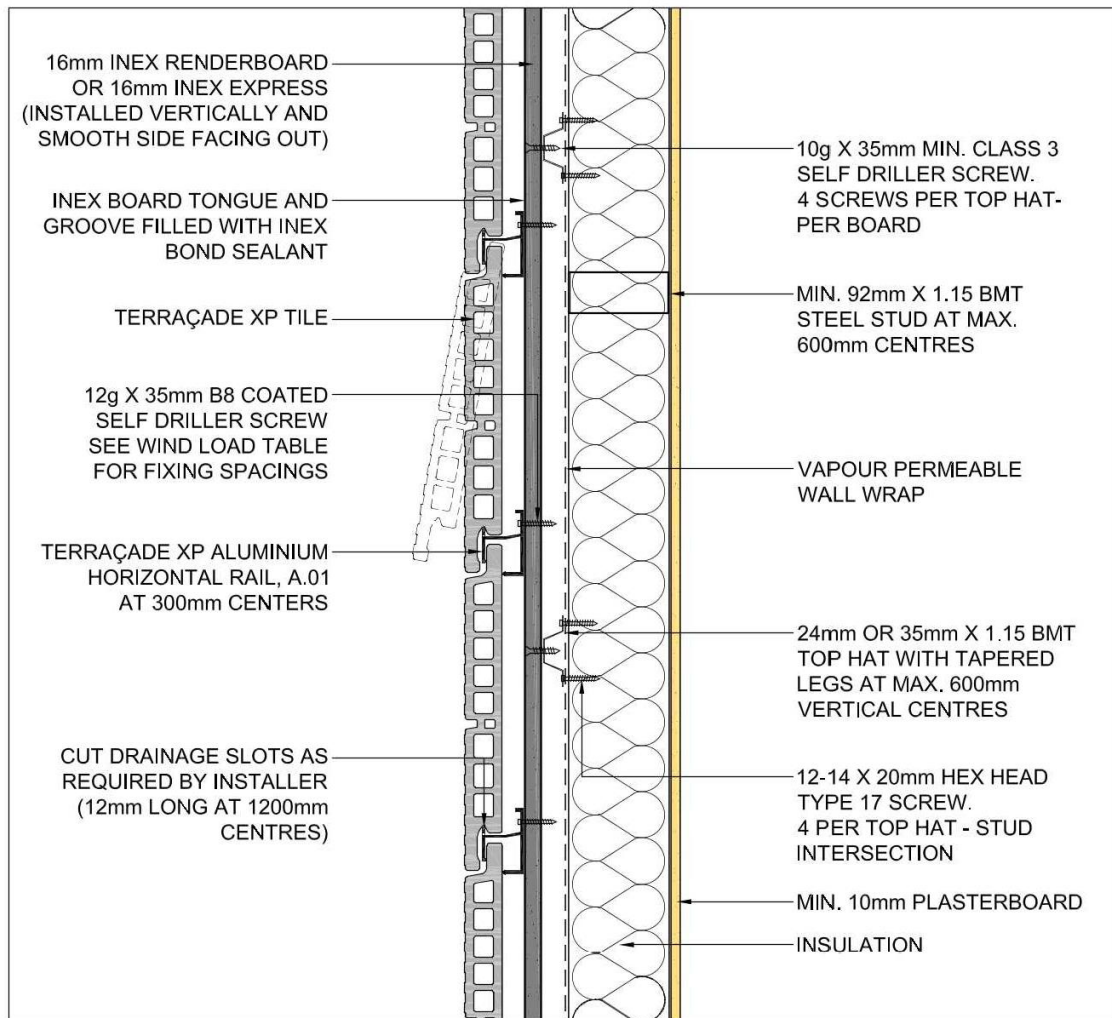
Vertical INEX>RENDERBOARD Wall System Steel or Timber Frame – Plan Section
